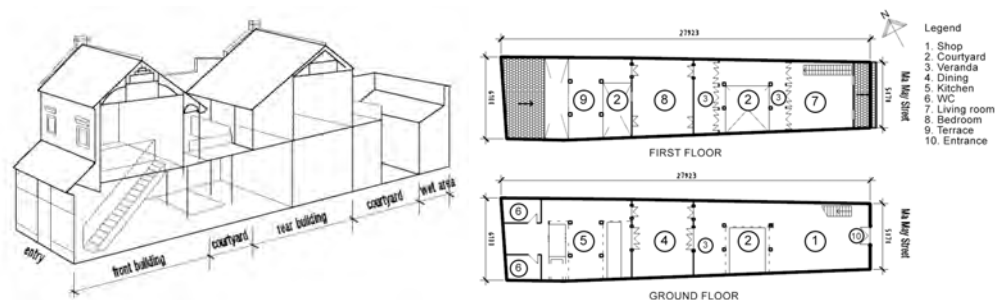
Spatial arrangement of the House at 87 Ma May, Hanoi (Ly, 2012)
